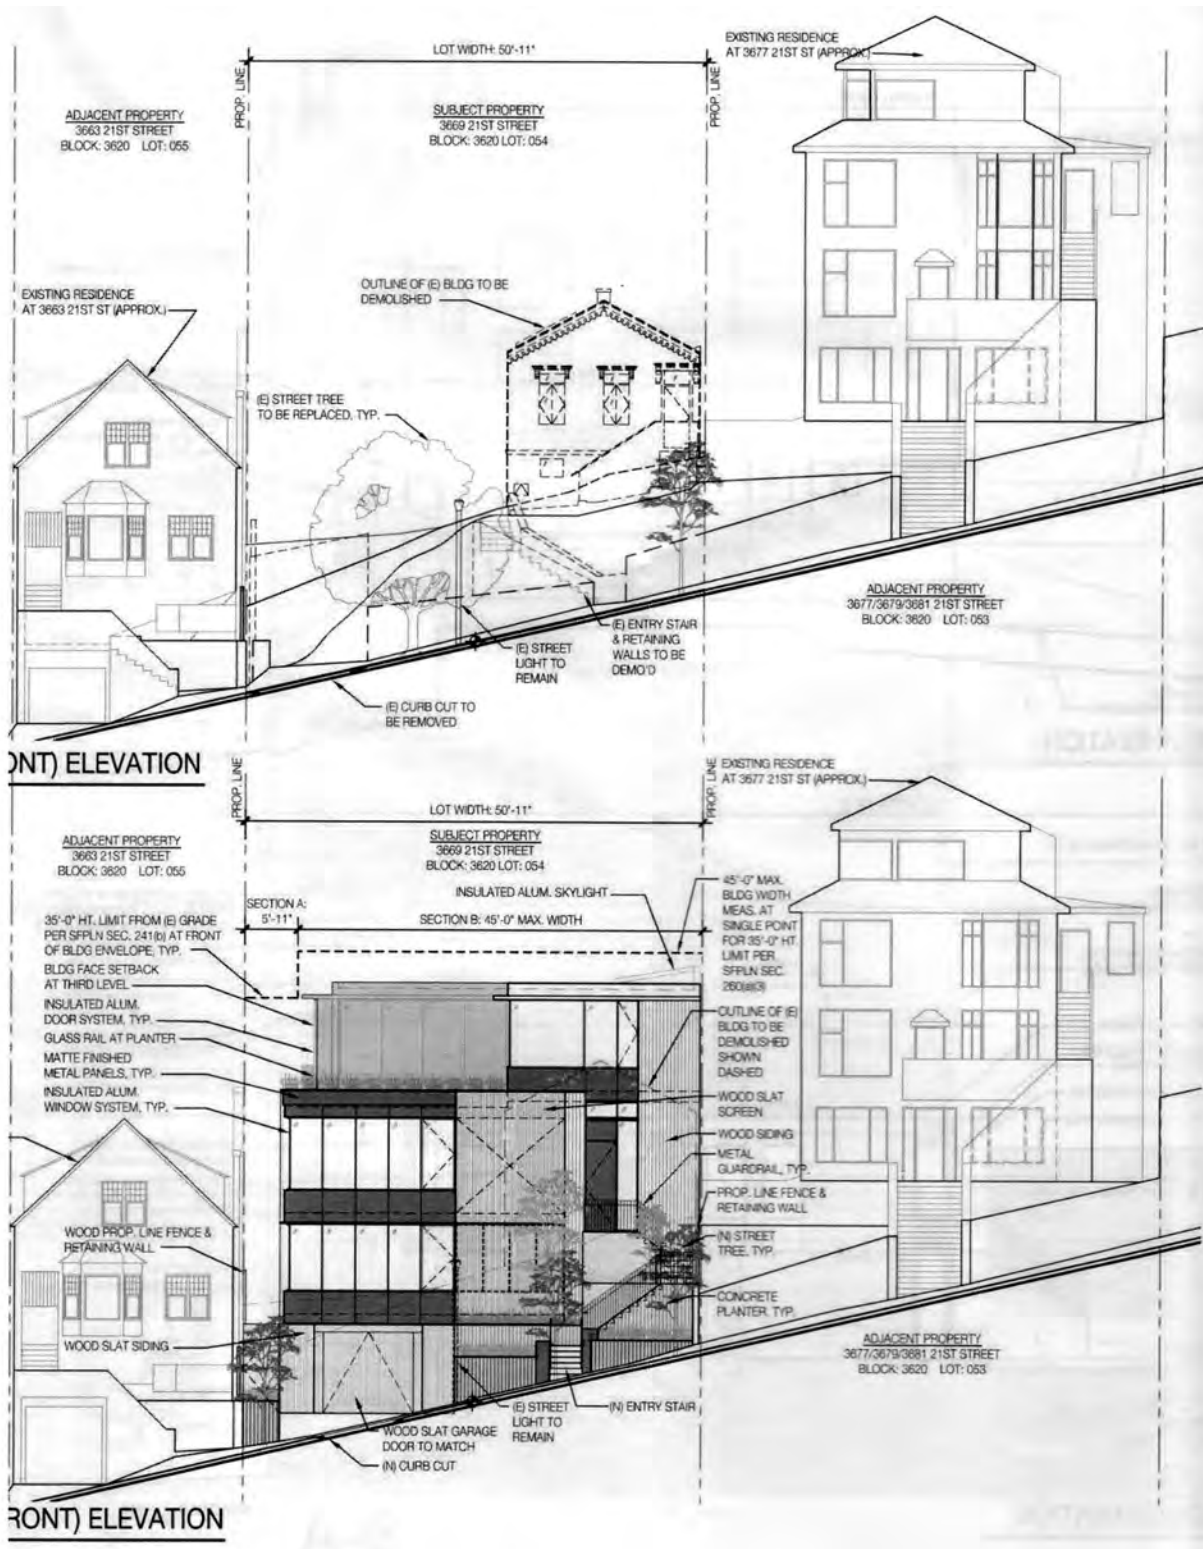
, detail of 3669 21st Street proposed site plan front elevation, sheet A-5, showing scale of project relative to my property, at left.
